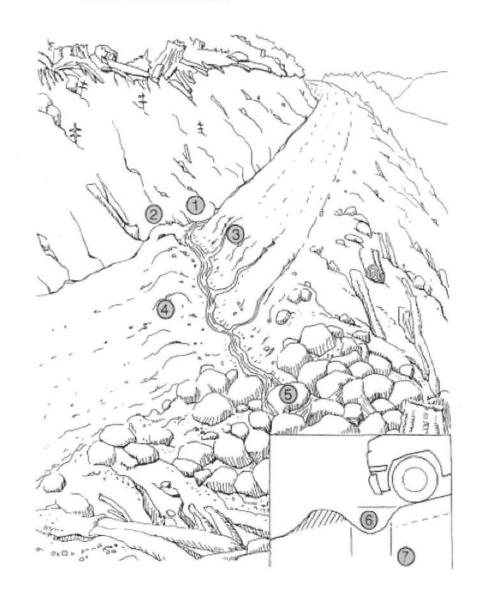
On roads that are to be closed (decommissioned), all stream crossing culverts and fills should be removed. Stream crossing excavations are best performed using an excavator. The original channel should be excavated and exhumed down to the former streambed, with a channel width equal or greater than the natural channel above and below the crossing. Sideslopes should be laid back to a stable angle, typically a 2:1 (50%) gradient, or less. Spoil can be endhauled off-site or stored on the road bench adjacent the crossing, provided it is placed and stabilized where it will not erode or fail and enter the stream.
